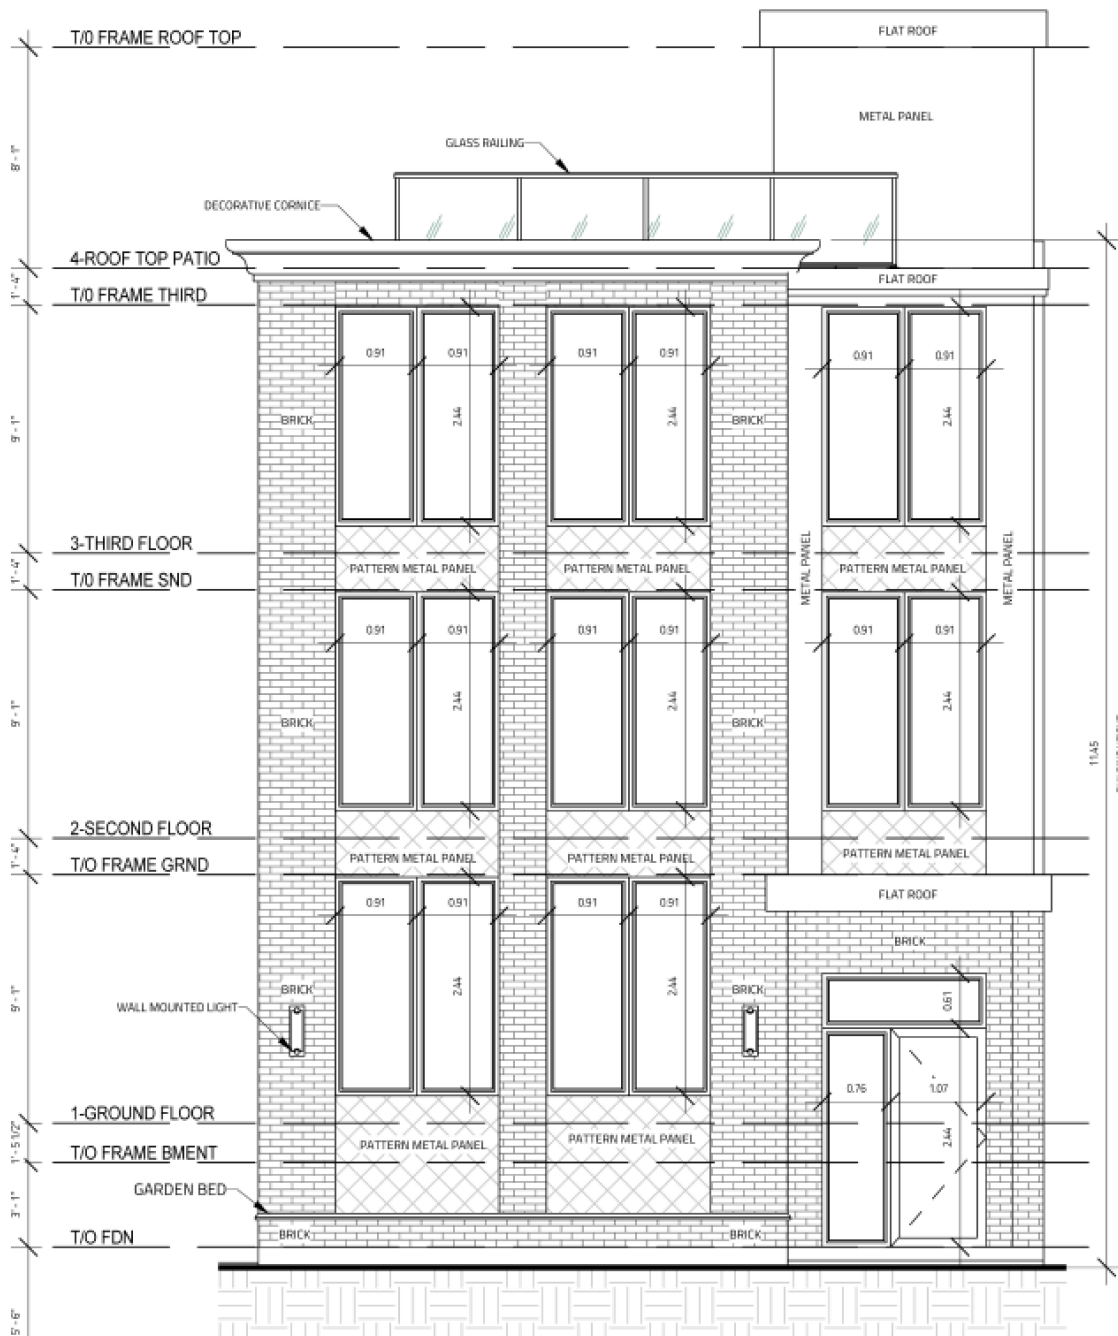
North (street) elevation of the proposed development. Evolution Design, 2019.
